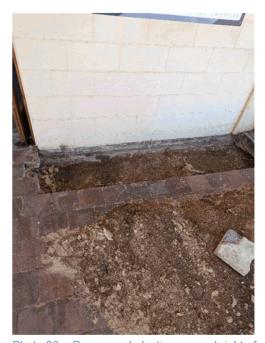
Pavers and plastic removed right of front door. Previous grout injection repairs evident
